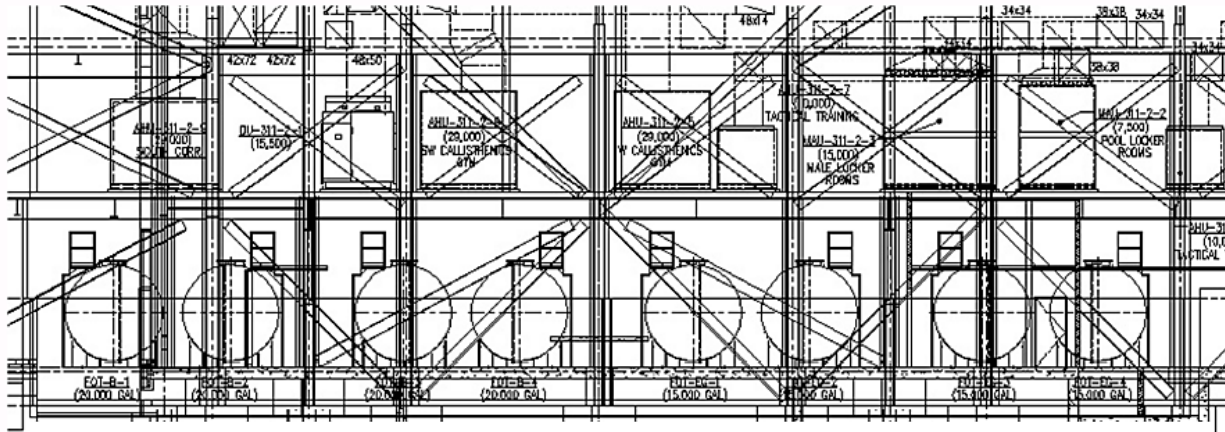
North-South Section of Central Utility Plant Displaying the Structural Steel System Surrounding the Fuel Tank Rooms
